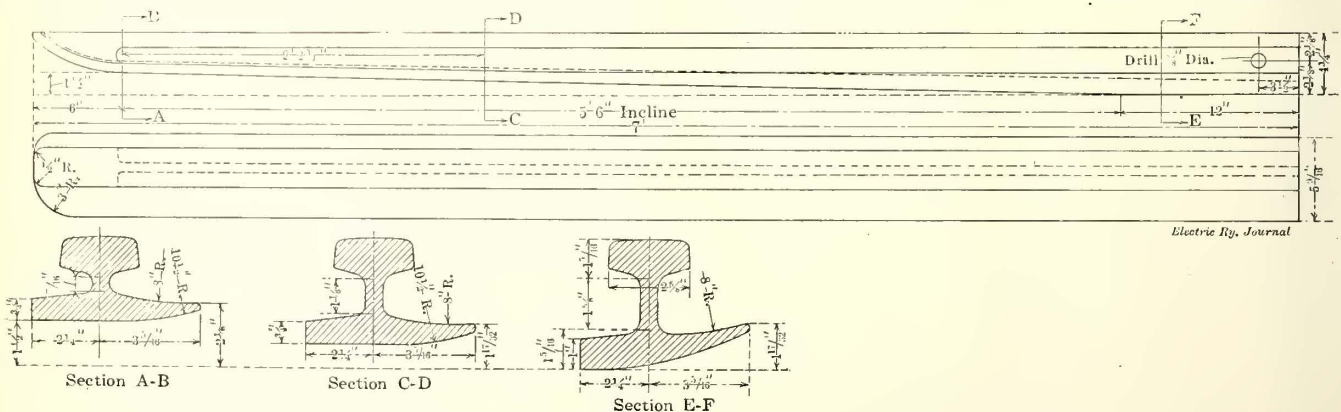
Detroit Tunnel—Plan and Section of Third-Rail Incline
